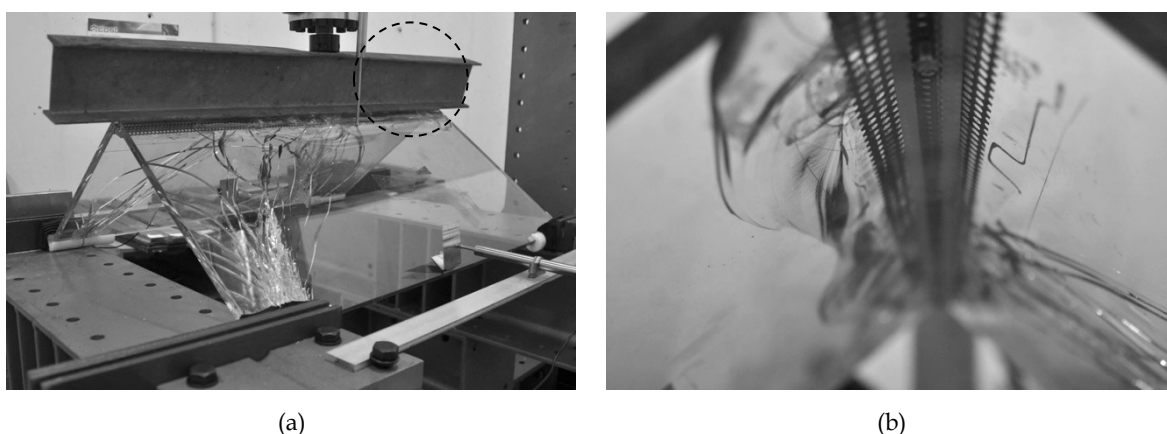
General view of specimen #3 during test (a) and close-up view (from below) of upper edge area of the specimen exhibiting a shell shaped breakage of glass in the upper joint (b).
